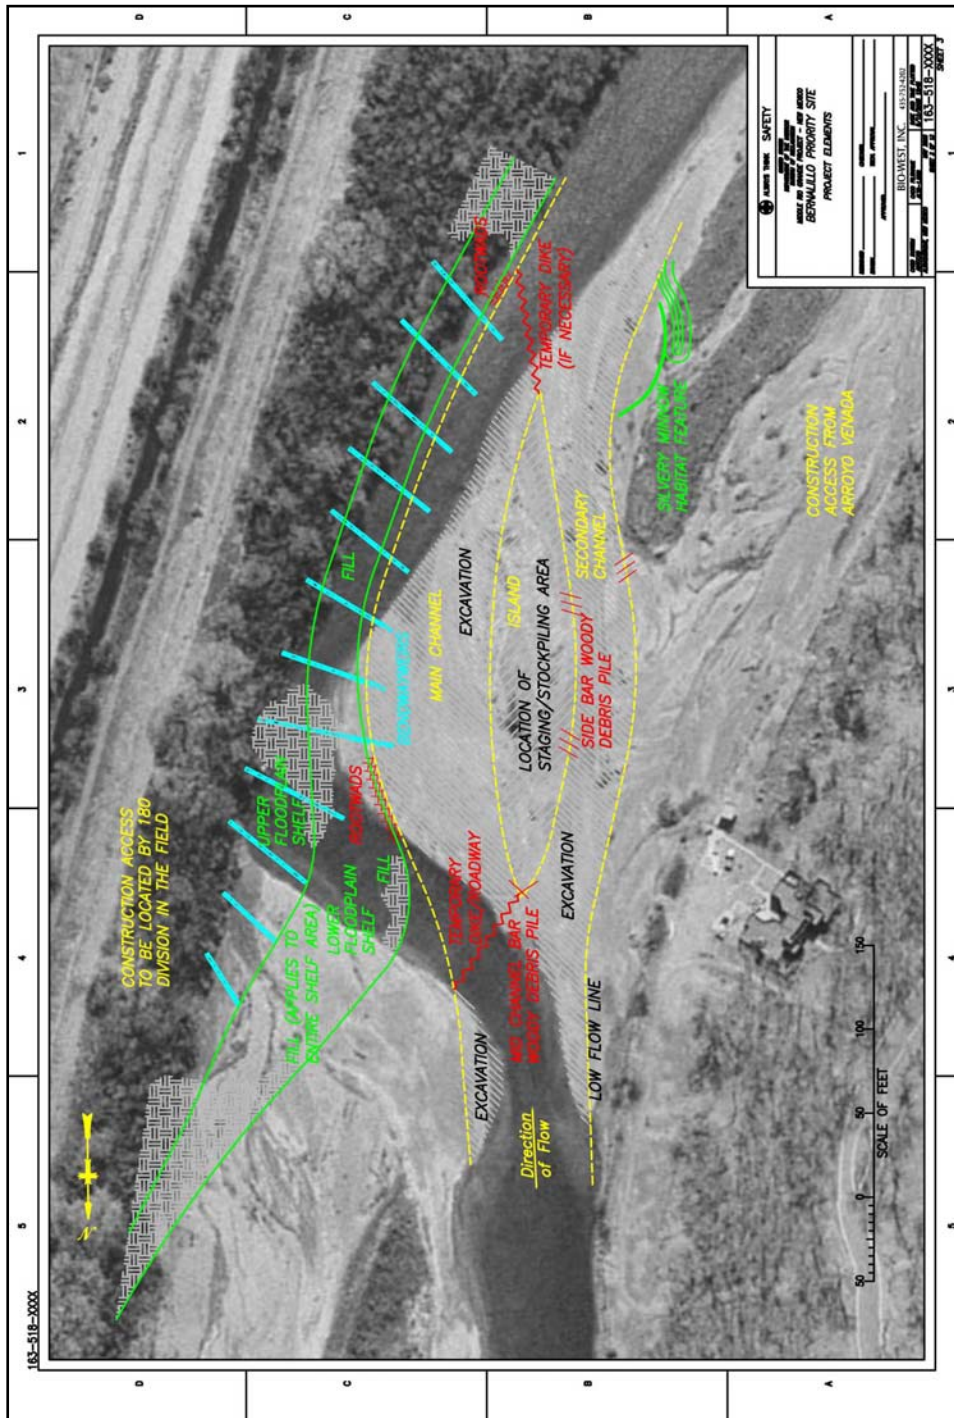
Construction Drawing Showing Pre-Project Conditions and Proposed Action.
